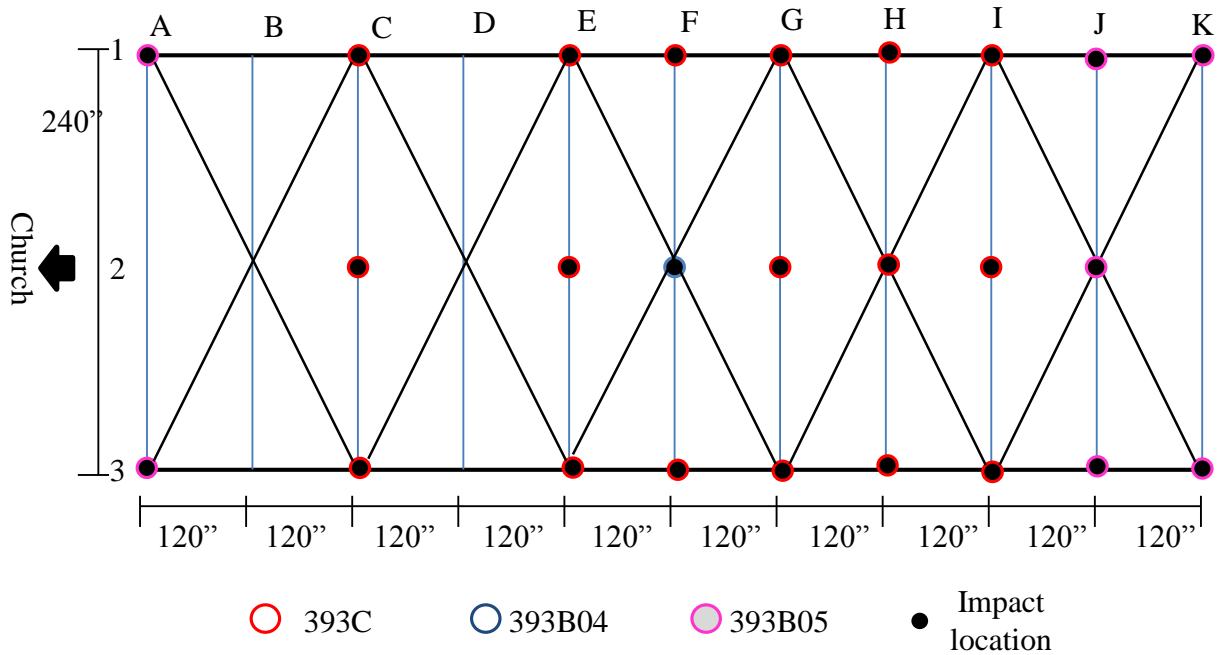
Portable Hammer Impact Locations for the Baptist Ford Bridge (Plan View of Deck)
